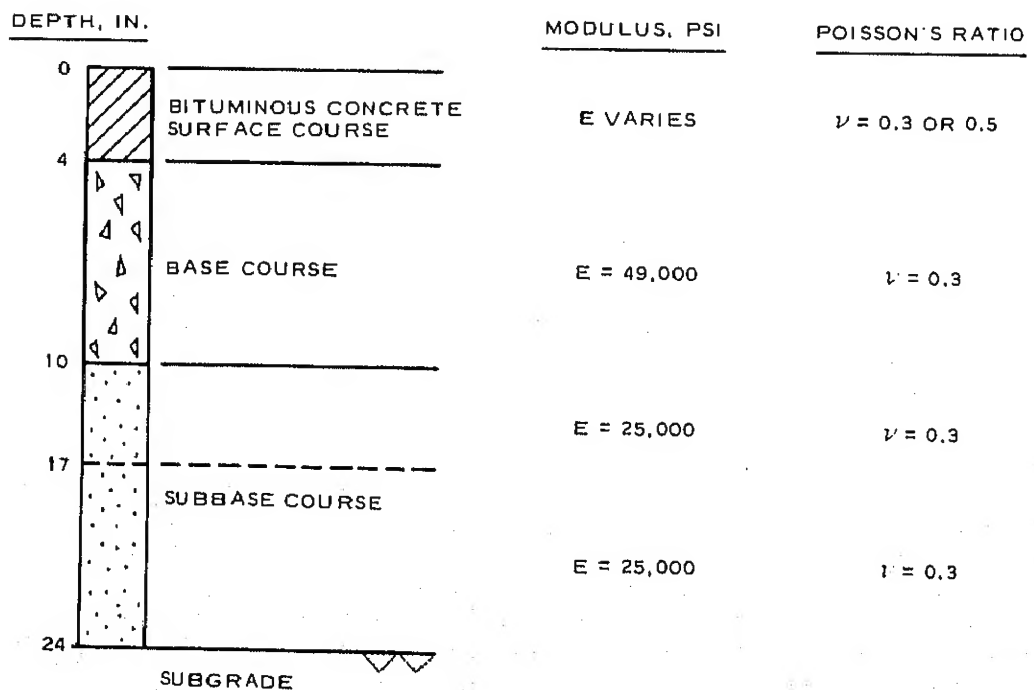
Section for pavement thickness of 24 inches for initial runway design.
